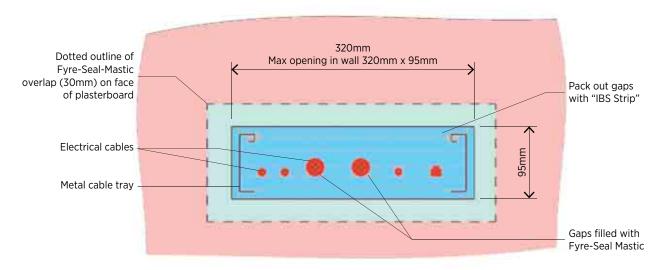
Penetration Detail - Cable Tray - Section Through Tray
